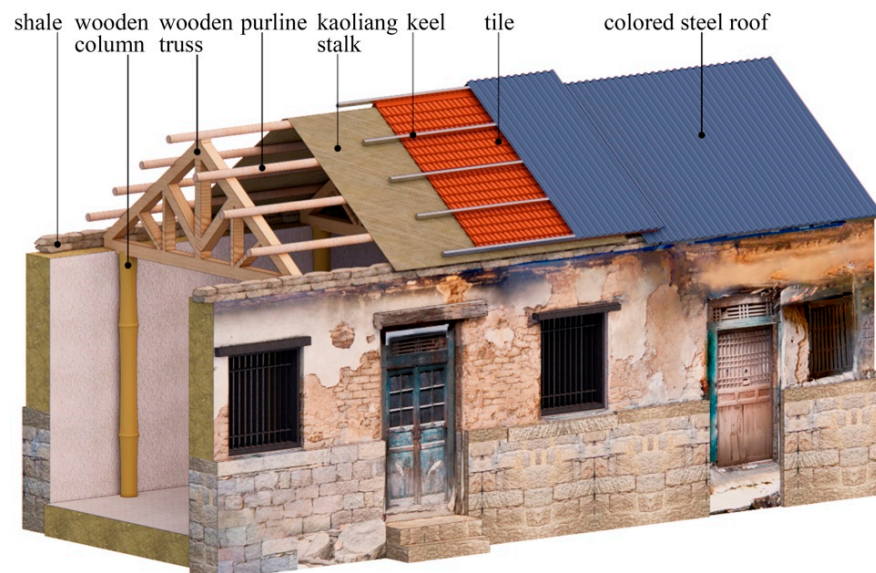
Structural and construction characteristics of No. 149 in Tangjiagou Village.
